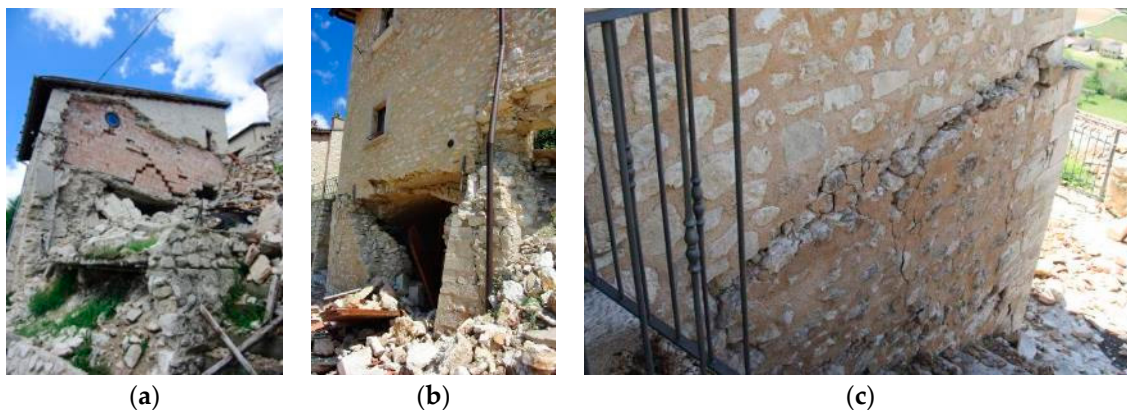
Example of differential retrofitting with reconstruction of the upper floors: (a) damage in the upper floors and collapse in the ground floor; and (b,c) no damage to the upper floor, but roto-translation above the partially collapsed ground floor.
